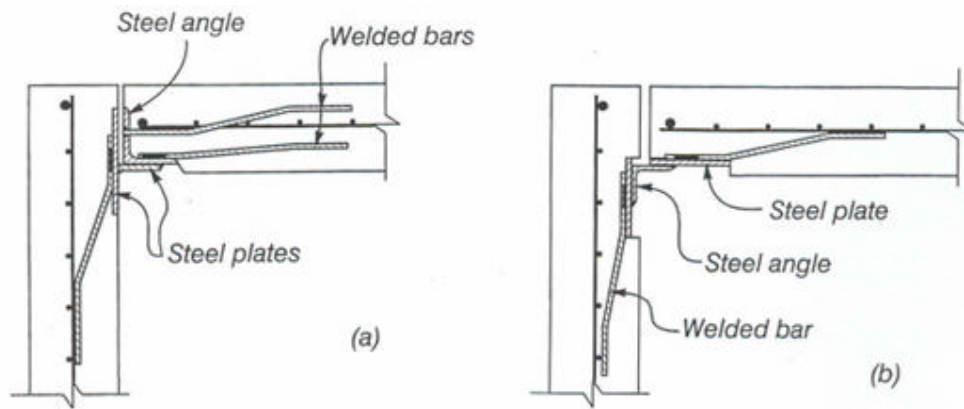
Typical welded connections for joining panels located in a corner (Restrepo *et al.*, 1996)
